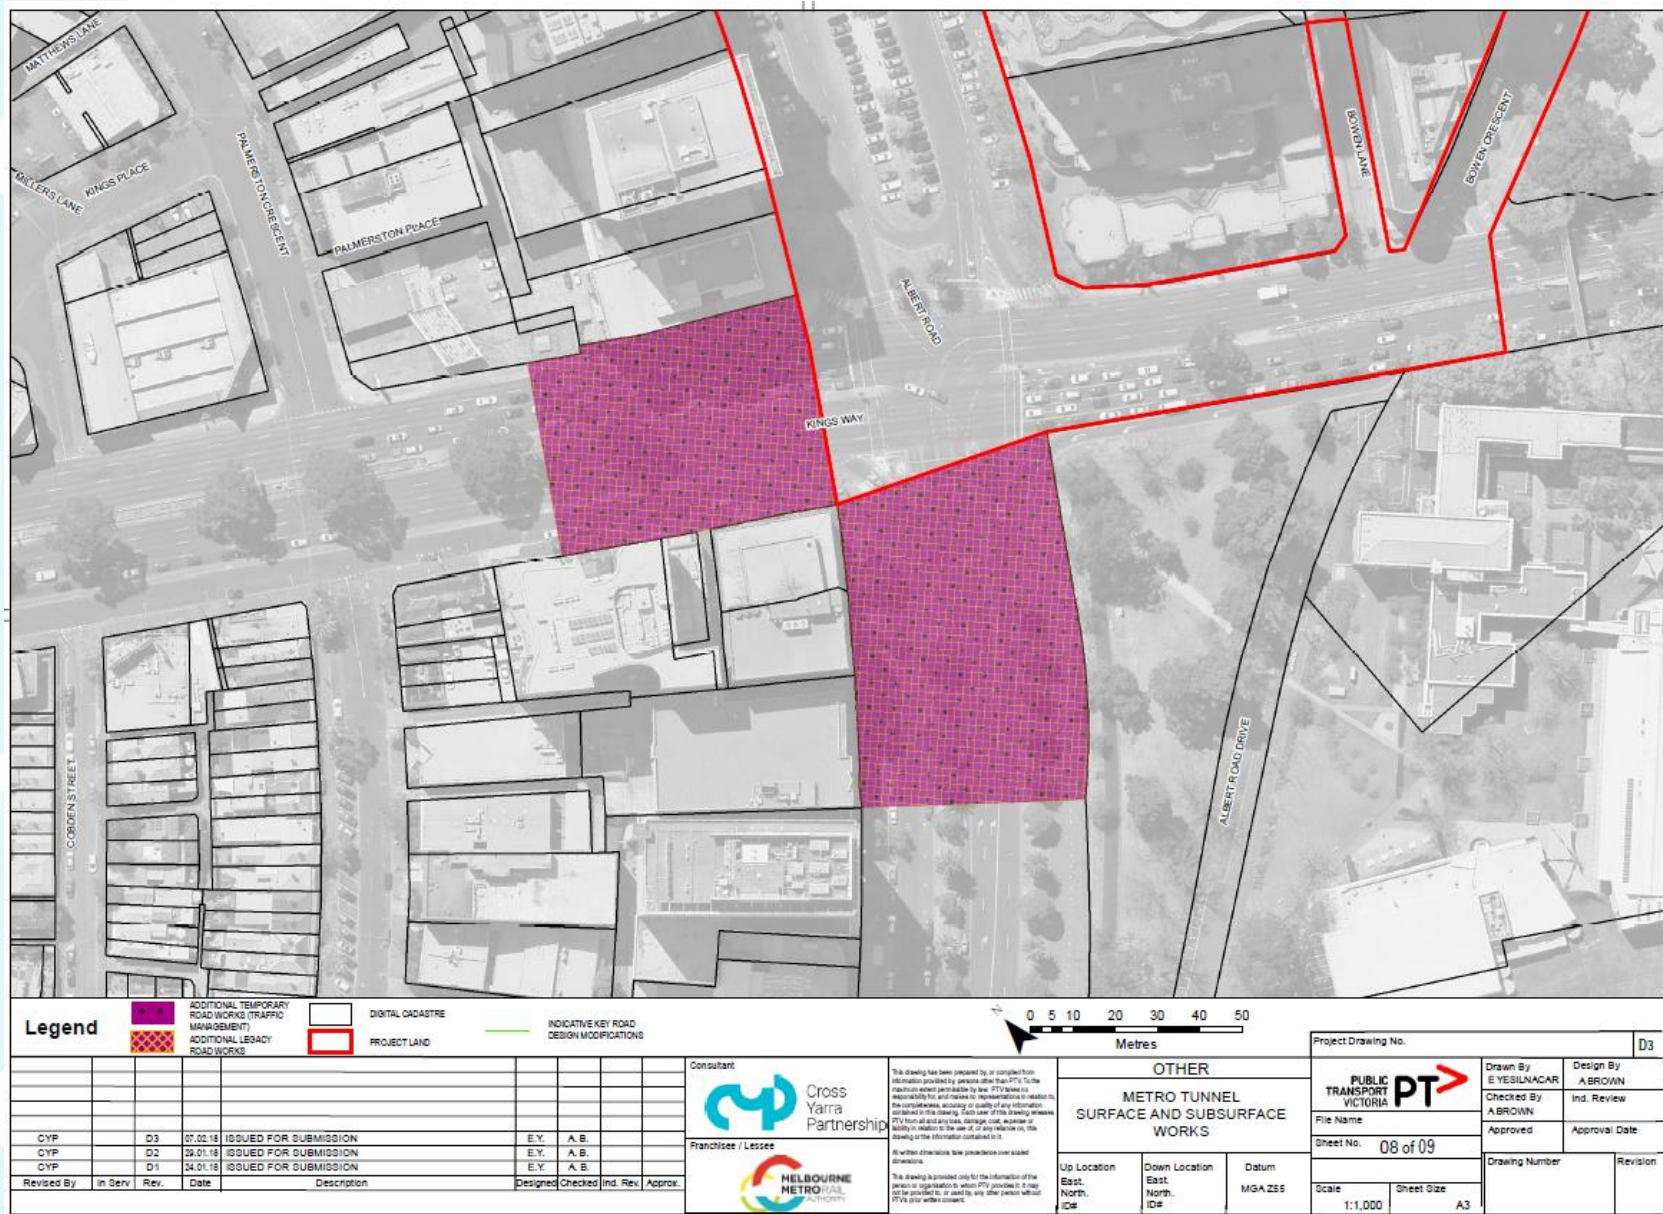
KINGS WAY AND ALBERT ROAD ADDITIONAL ROAD SURFACE WORKS
